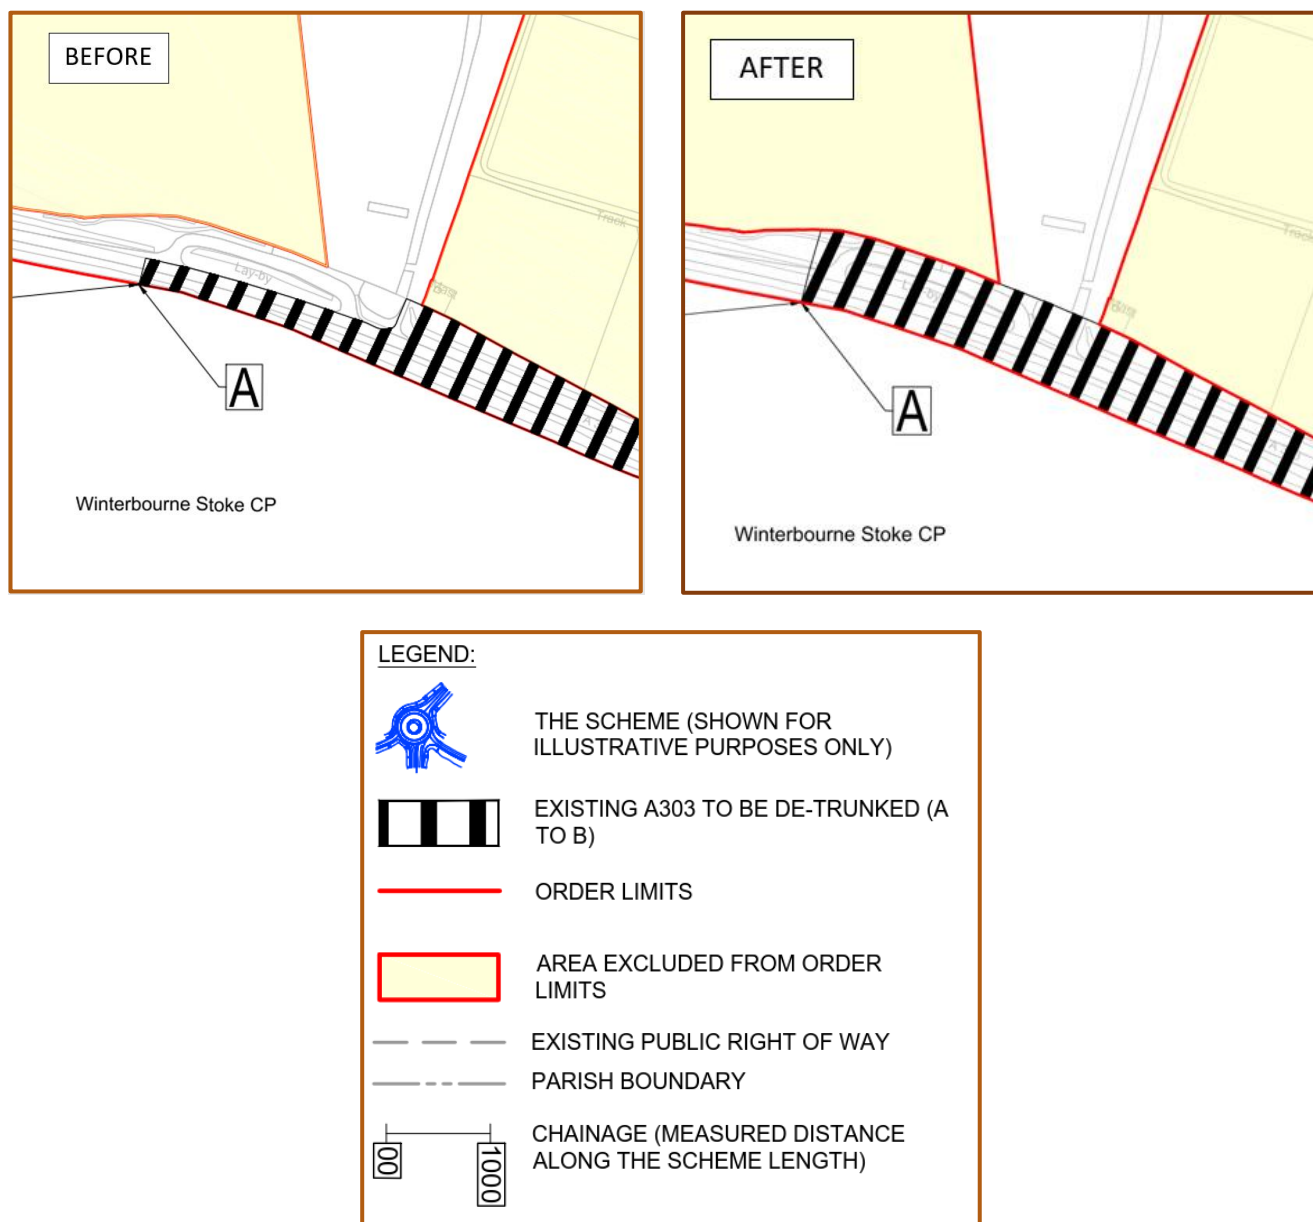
Extract from De-Trunking Plans [APP-015]
